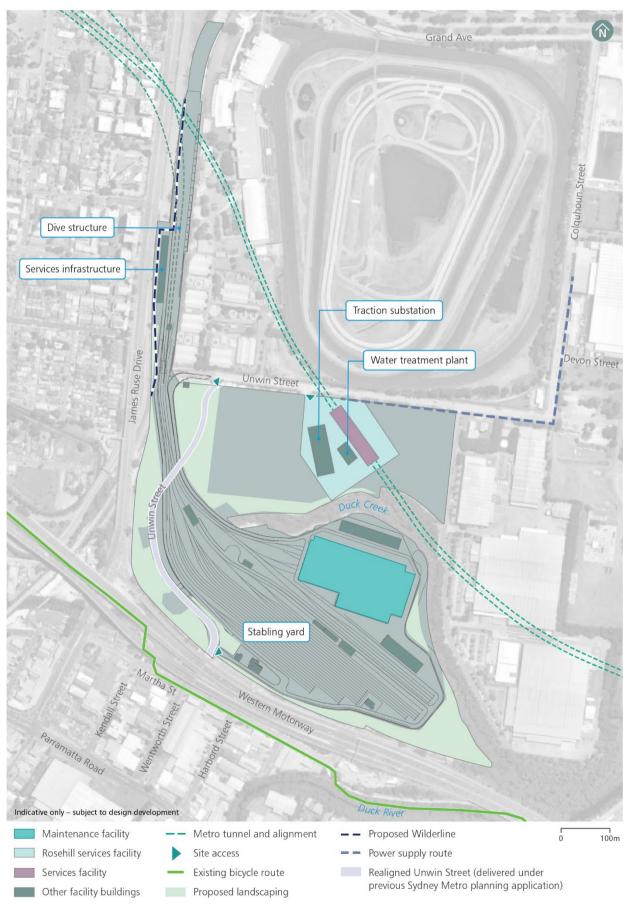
Revised indicative layout and key design elements – Clyde stabling and maintenance facility and Rosehill services facility
